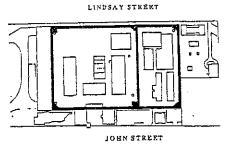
Plan of gaol showing Walled Areas and towers.
